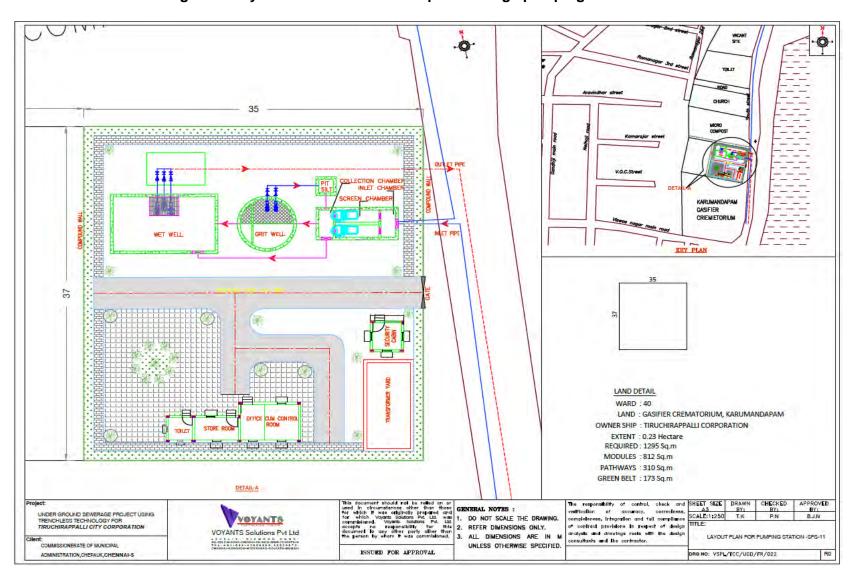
Layout Plan on Revenue Map for Sewage pumping stations 11
